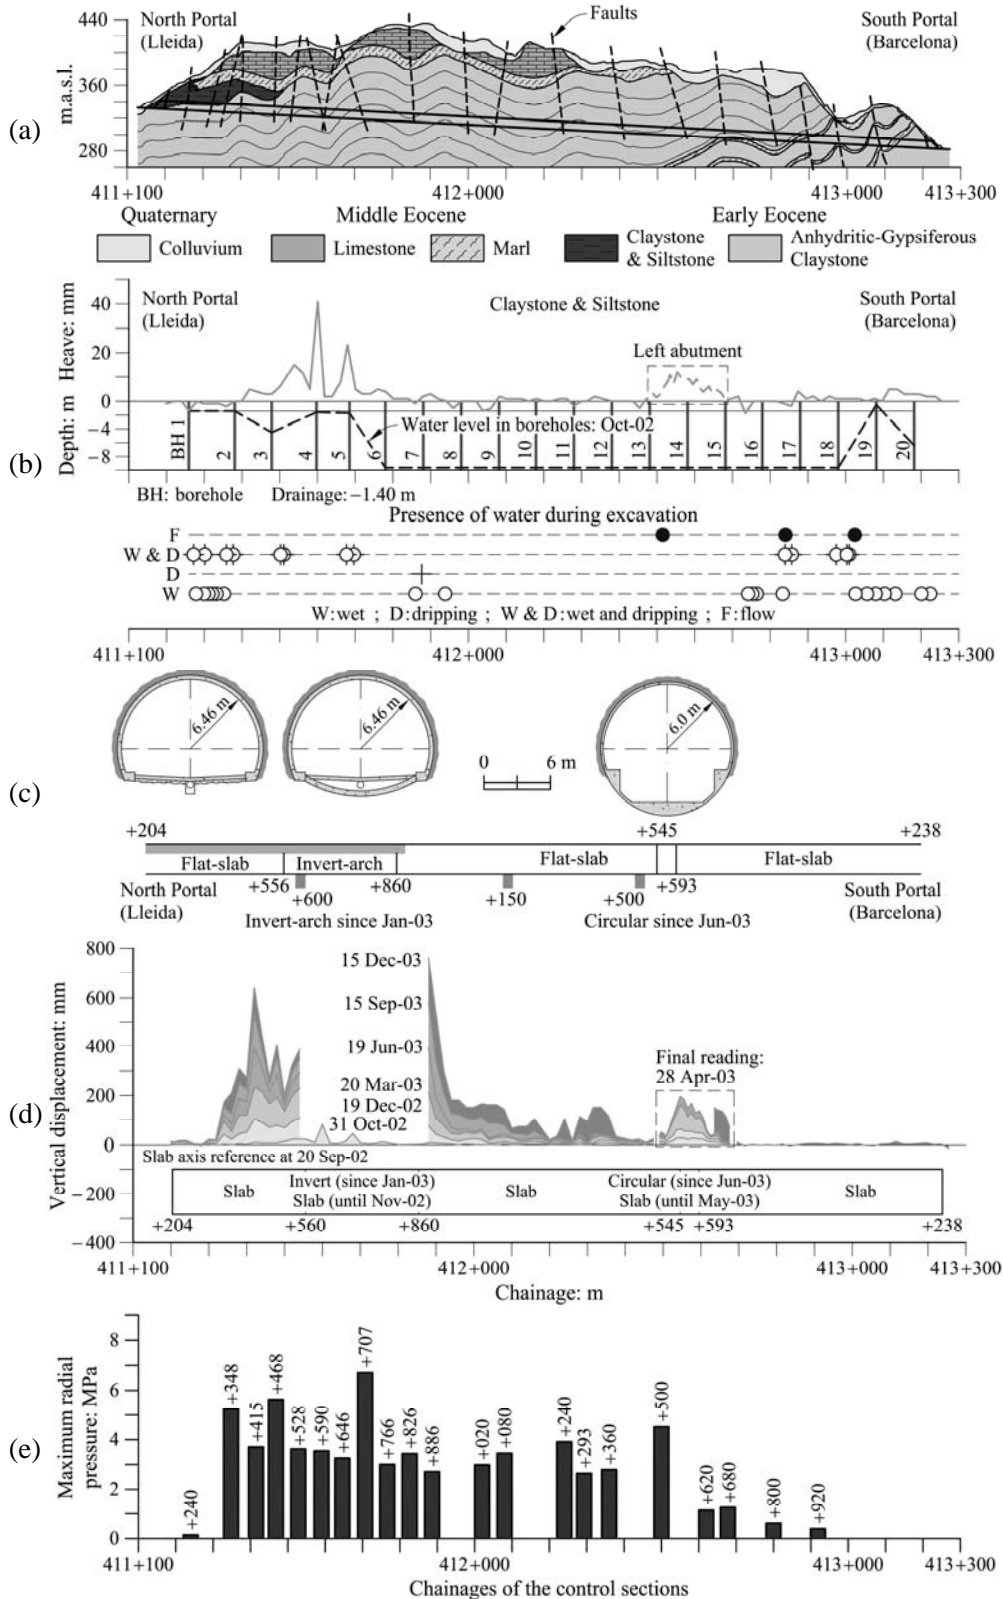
Longitudinal section of Lilla tunnel: (a) geology; (b) profile of floor heave in October 2002 and water conditions detected during tunnel excavation; (c) initial cross-section (horseshoe shape) and testing sections; (d) evolution of heave displacements of the flat-slab between October 2002 and December 2003; (e) maximum radial pressures recorded in the period from January 2005 to Dec. 2011
